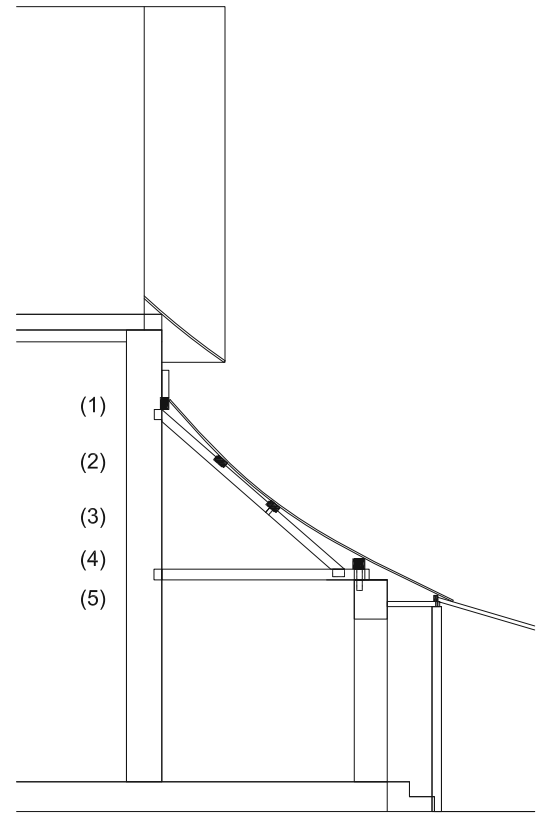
Cross section of the aisle roof structure presenting five levels of purlin
